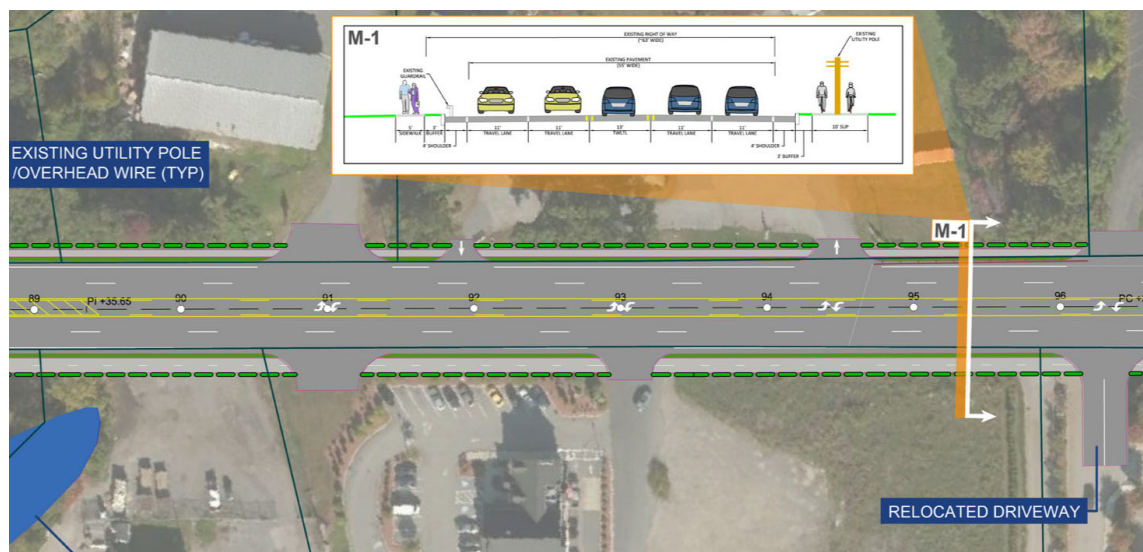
US 20 corridor master plan—concept plan near a fast food restaurant driveway.
